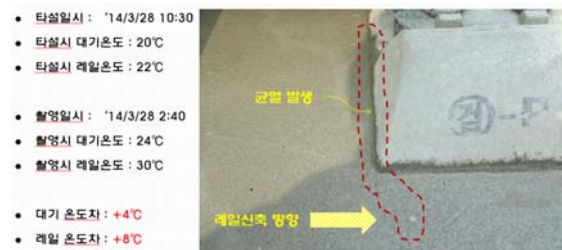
Concrete crack after 4 hours pouring concrete
